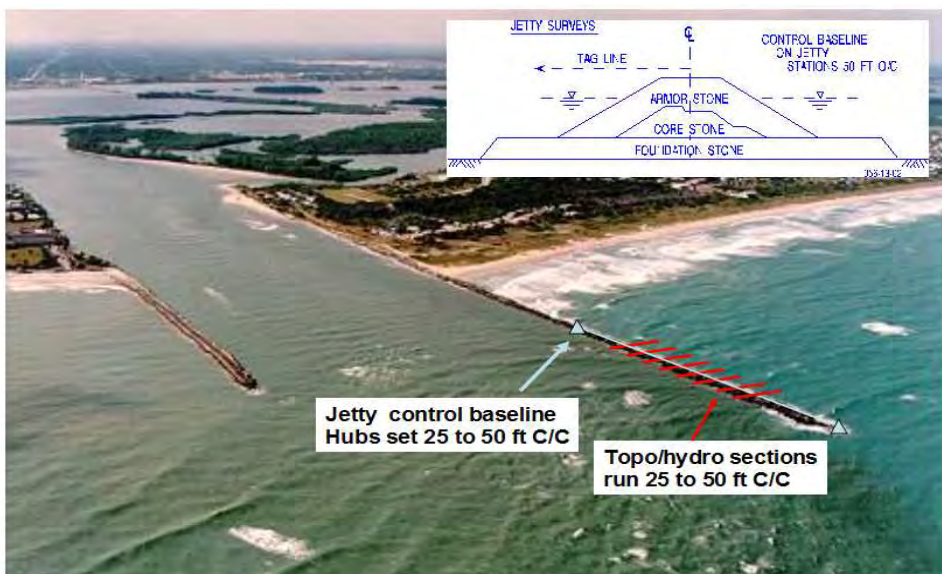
Jetty and breakwater surveys—traditional baselines set along structure for cross sectional surveys.
